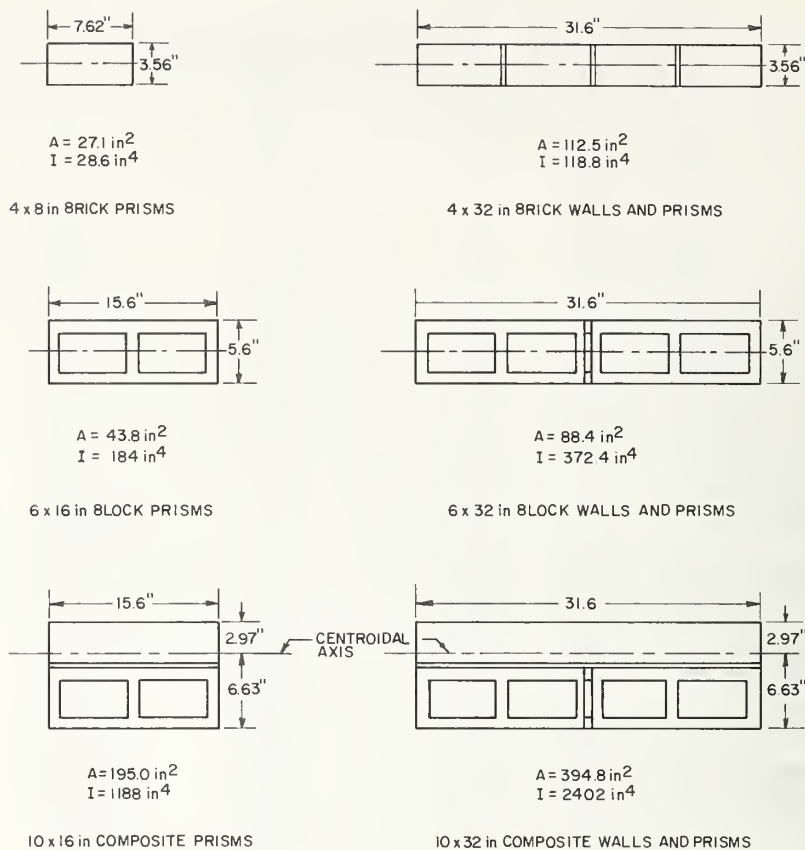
Cross-sectional dimensions of test specimens.
